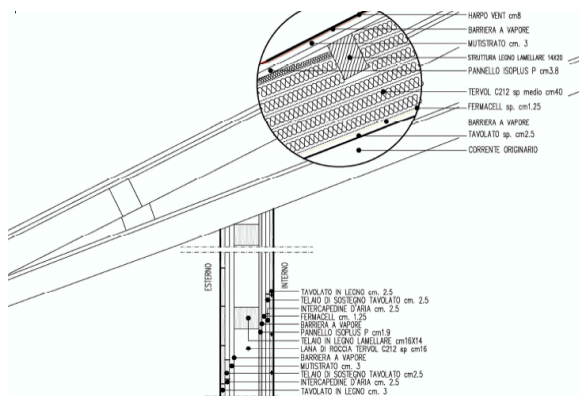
AlpHouse pilot-building in Selva di Cadore, sectional detail after renovation, by Studio Arch. Giusto for Regione del Veneto
